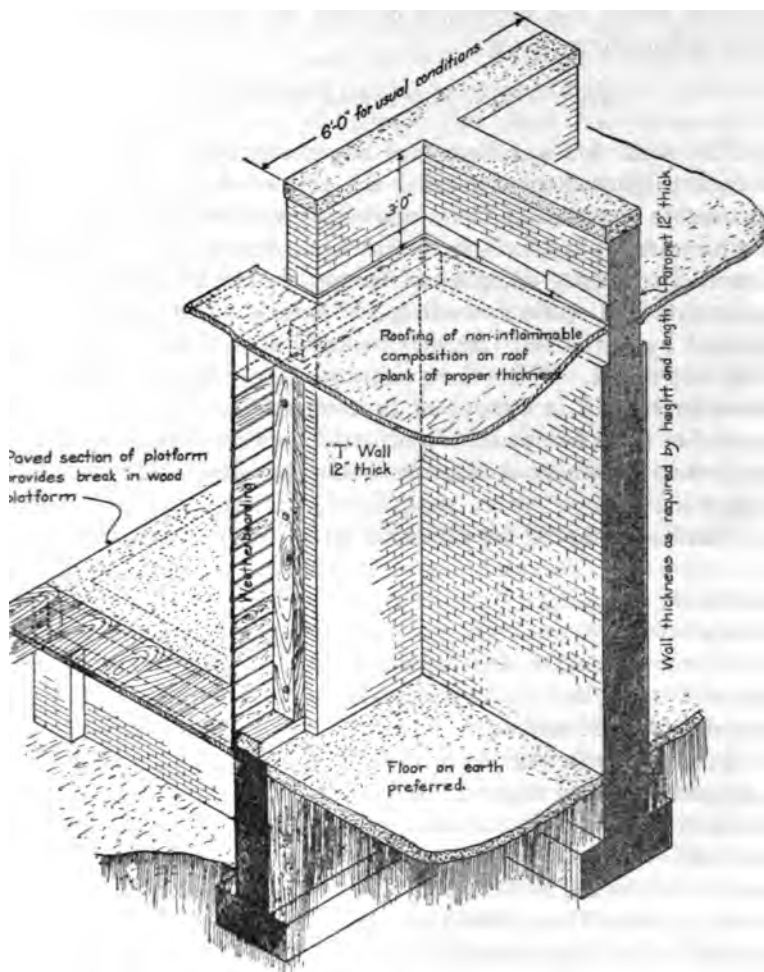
Method of forming fire stop by division fire wall without obstruction to platforms.
